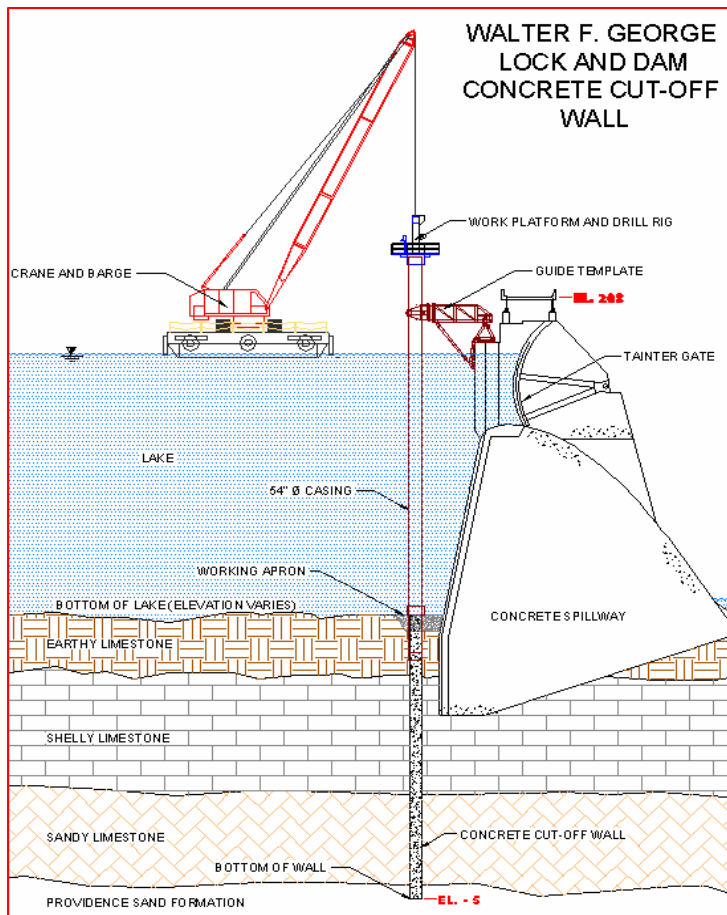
Section of the Secant Pile Wall, W.F. George, AL (Ressi, 2005).
